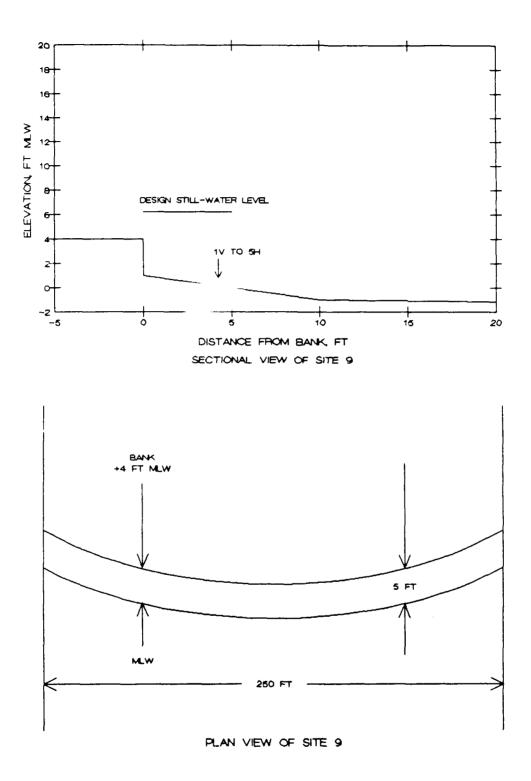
SECTIONAL AND PLAN VIEWS OF SITE 9
